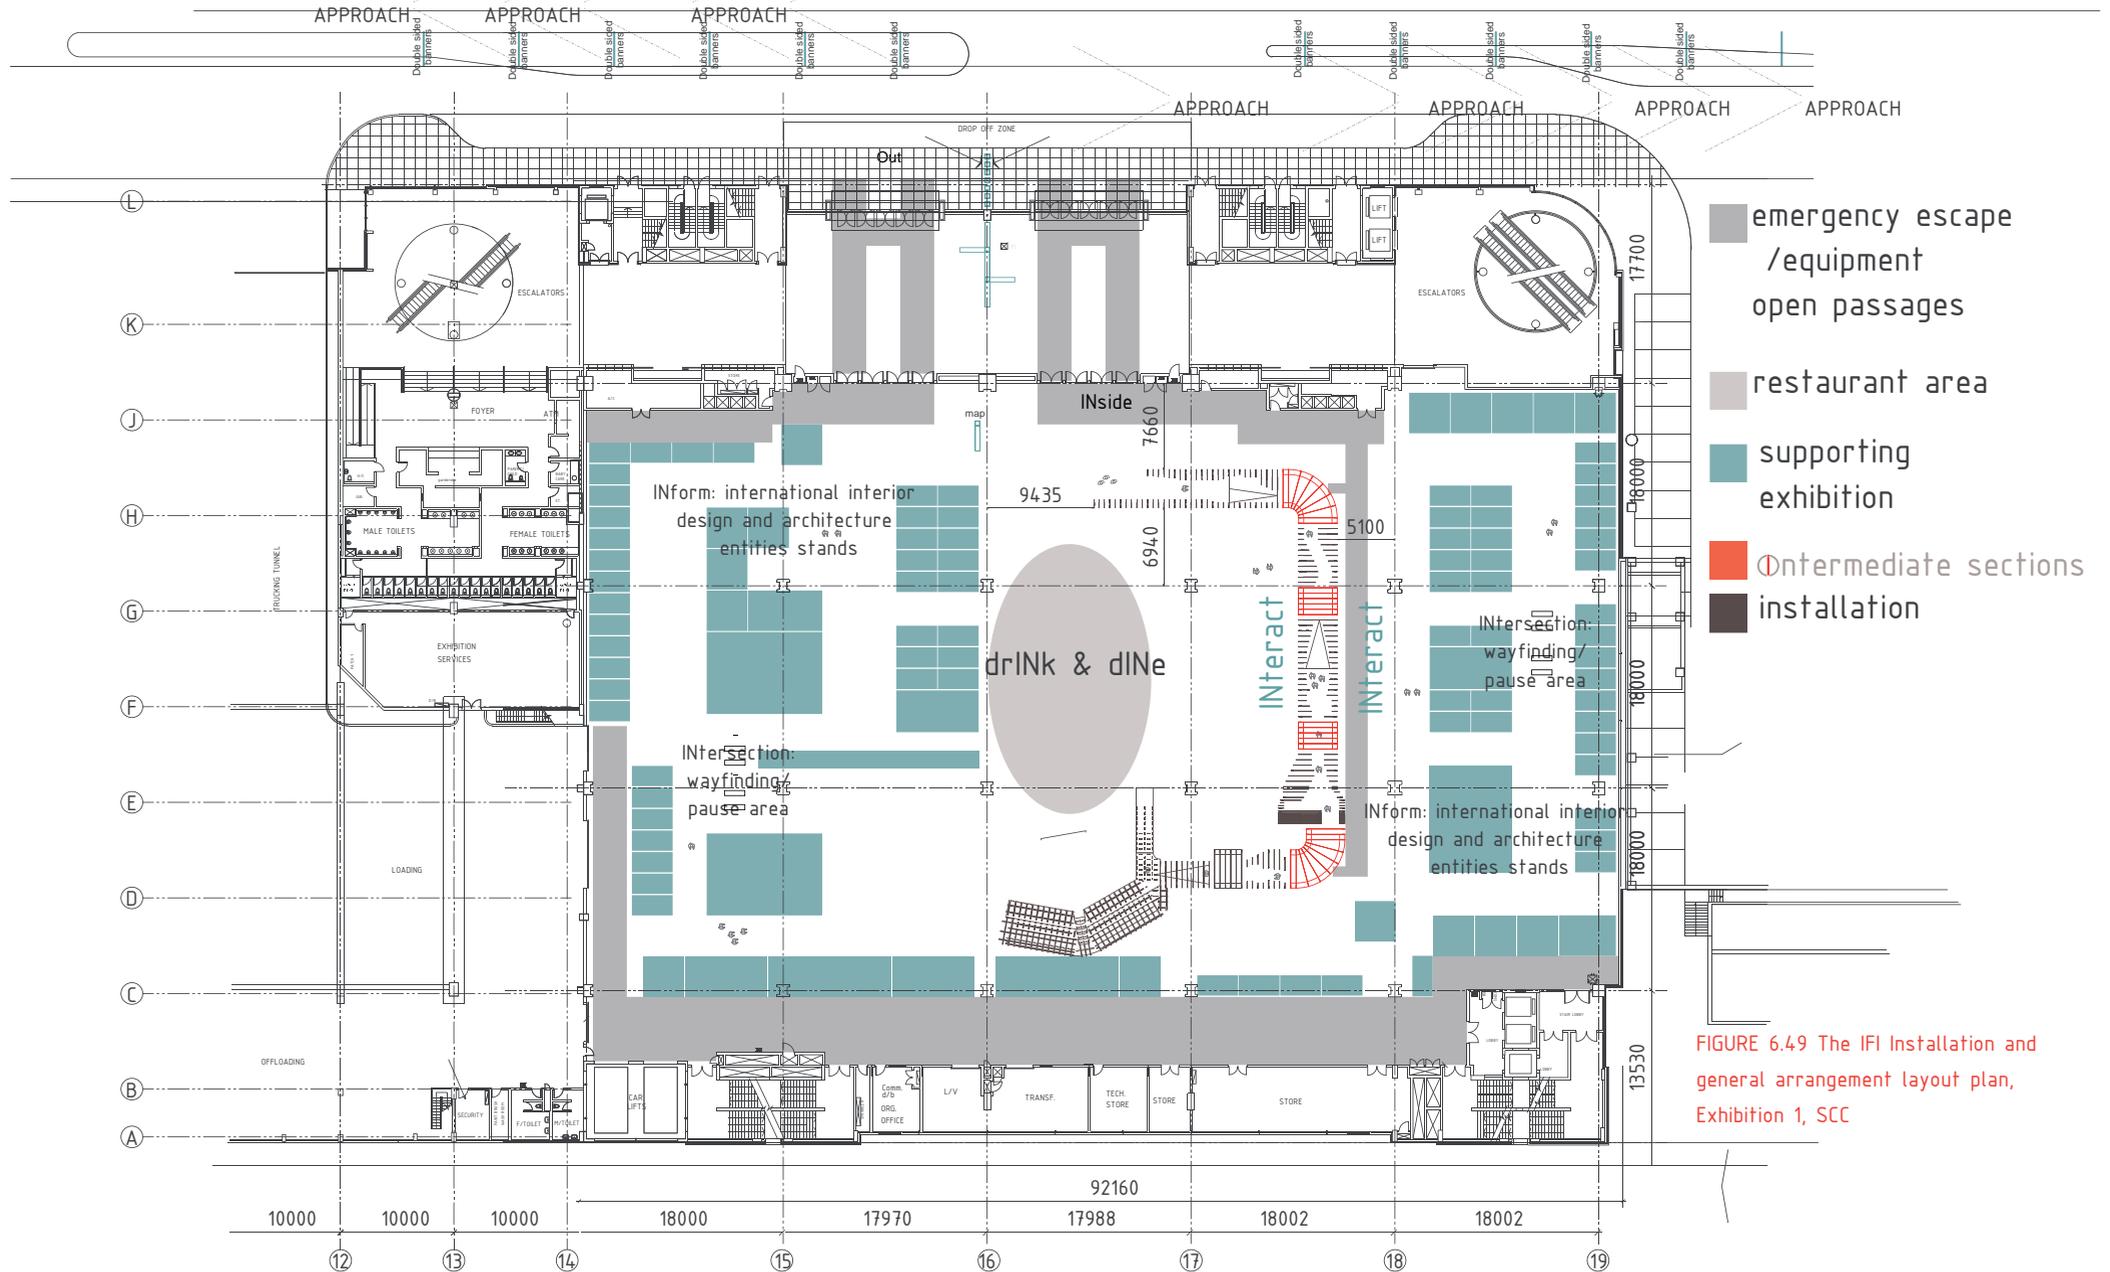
The IFI Installation and general arrangement layout plan, Exhibition 1, SCC
